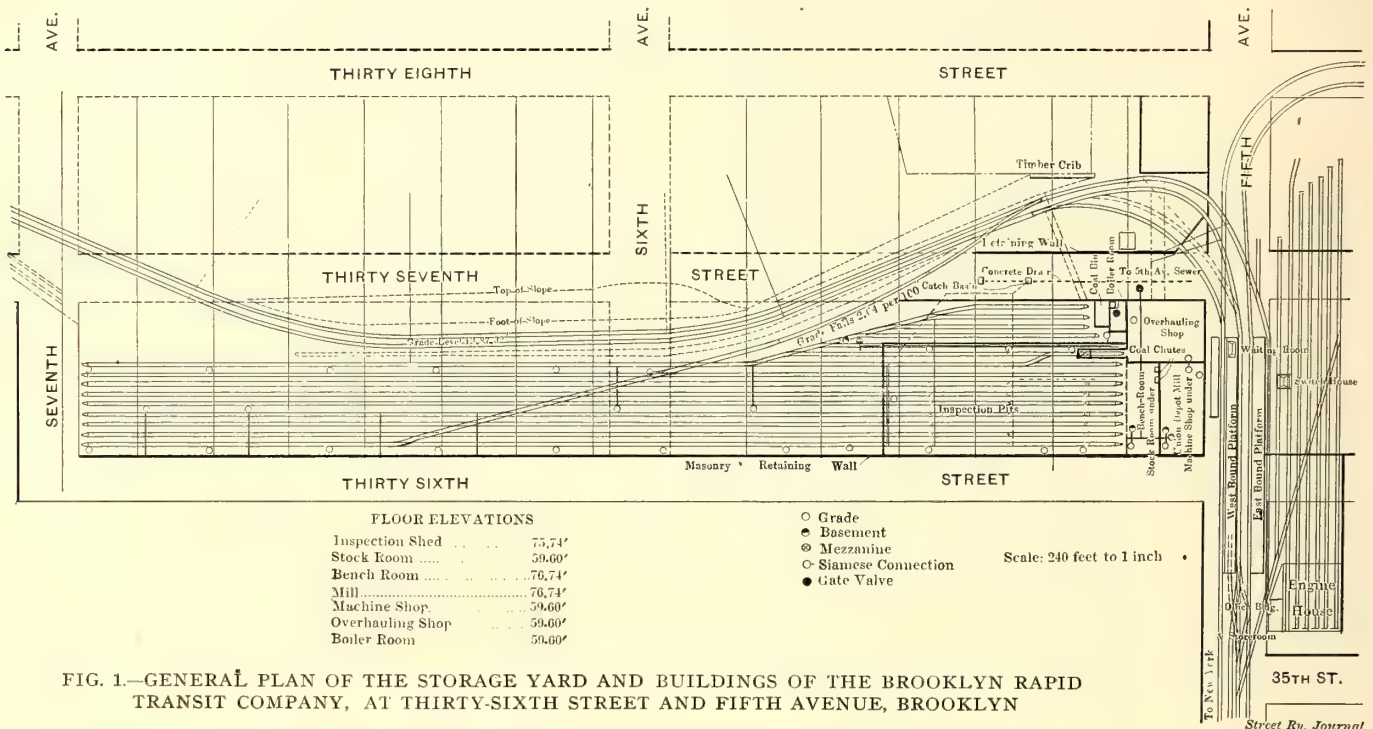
GENERAL PLAN OF THE STORAGE YARD AND BUILDINGS OF THE BROOKLYN RAPID TRANSIT COMPANY, AT THIRTY-SIXTH STREET AND FIFTH AVENUE, BROOKLYN
